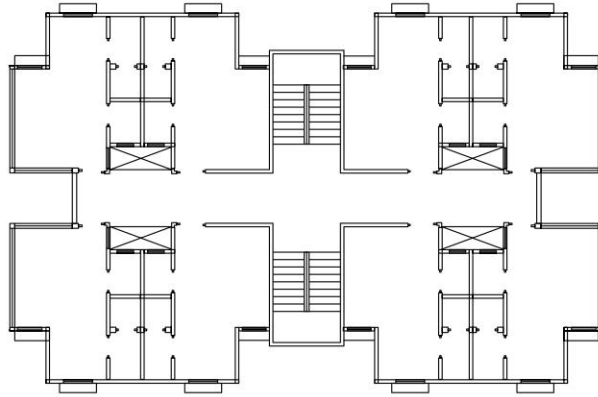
A Typical Floor Plan of a Multi-story Building to Illustrate the Cycle Time.
